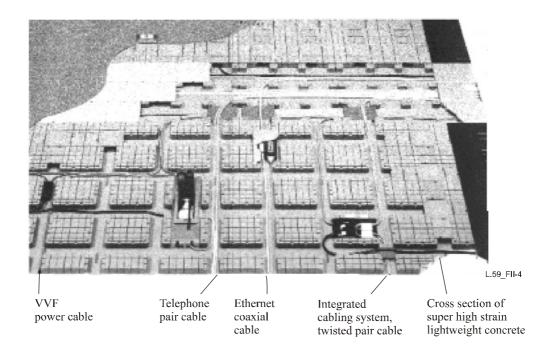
/L.59 – Example of simplified access floor system (Floor-mounted type)
